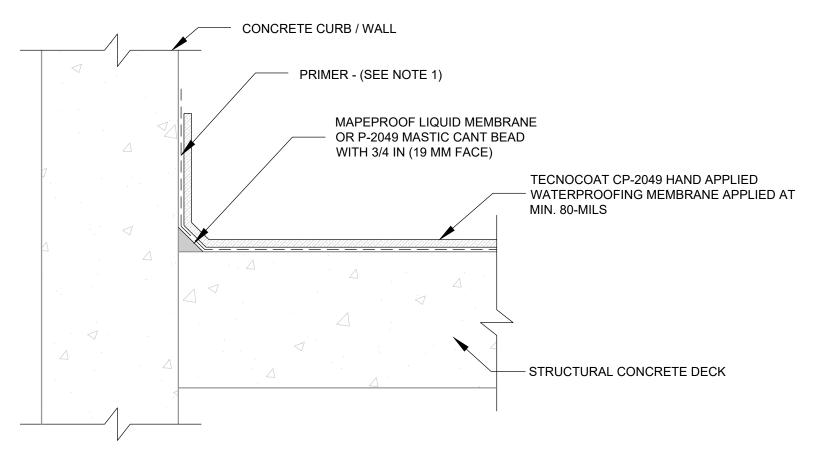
DETAILS ARE INTENDED TO BE A GUIDE FOR WATERPROOFING INSTALLATION ONLY
